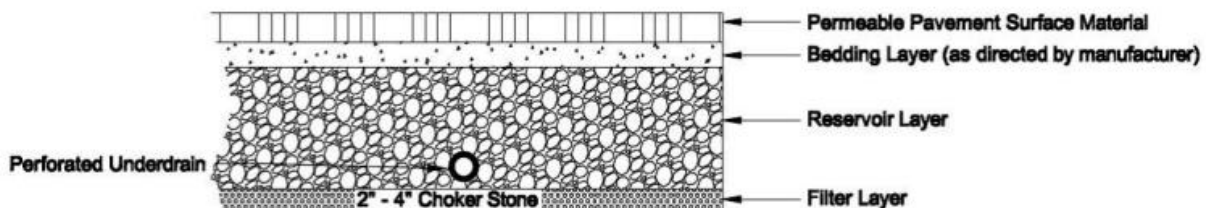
Cross section of a Standard permeable pavement design⁵⁴²
